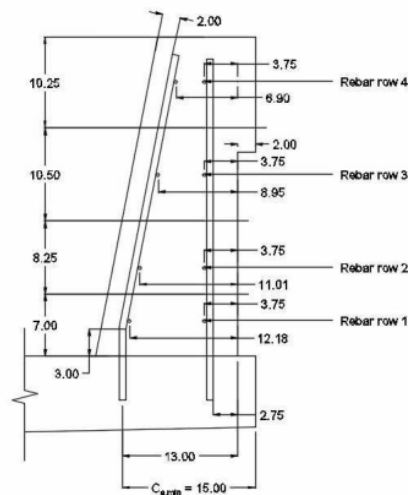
Rebar geometry required for calculation of capacity (units of in.)
